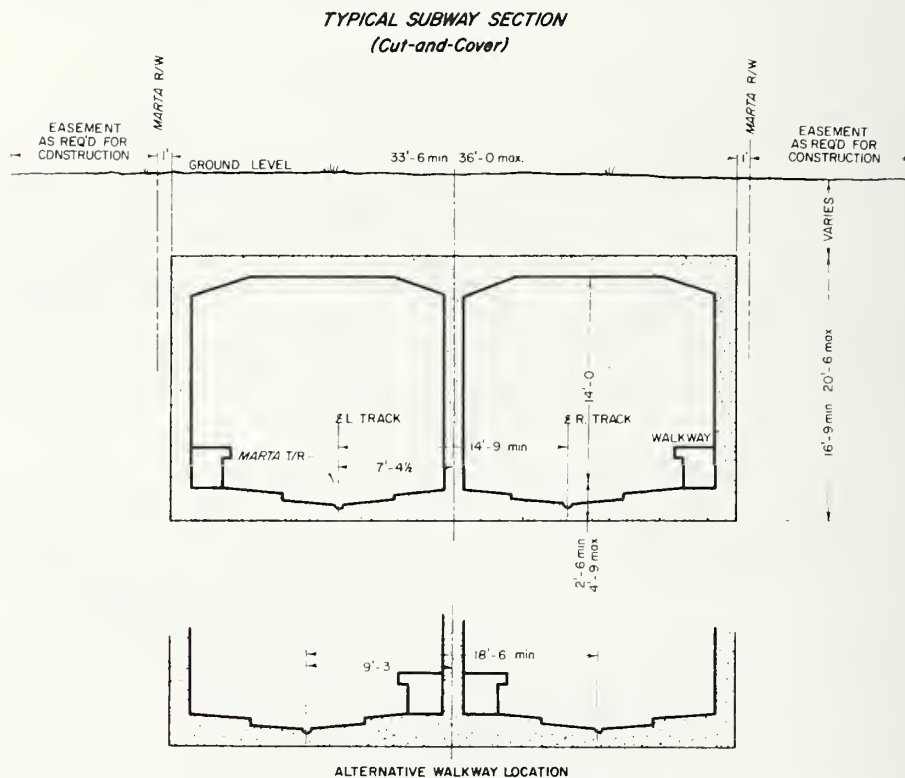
TYPICAL SUBWAY SECTION - CUT AND COVER [10-6]
